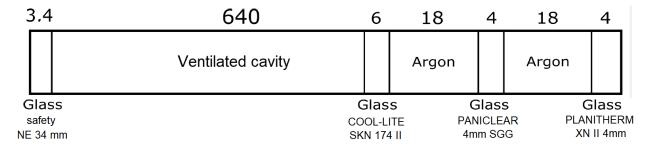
Horizontal cross-section view of the DSF 23 experimental setup (all dimensions are in millimeters) [1].
